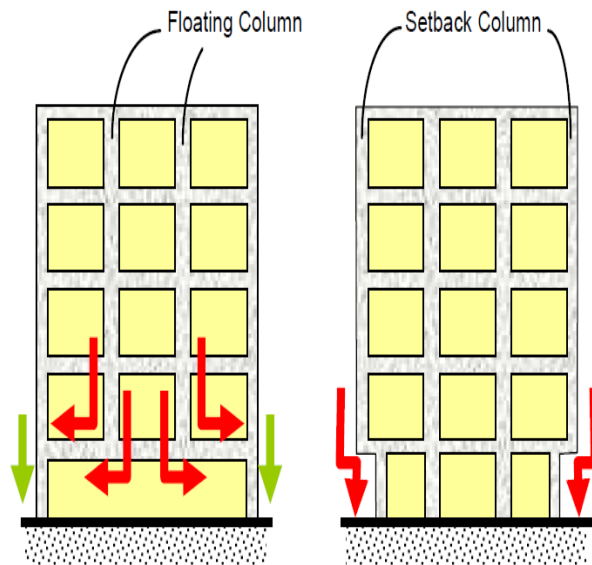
(a) floating column: the column is discontinued at a lower level, and (b) set-back column: the column is moved out of plumb
